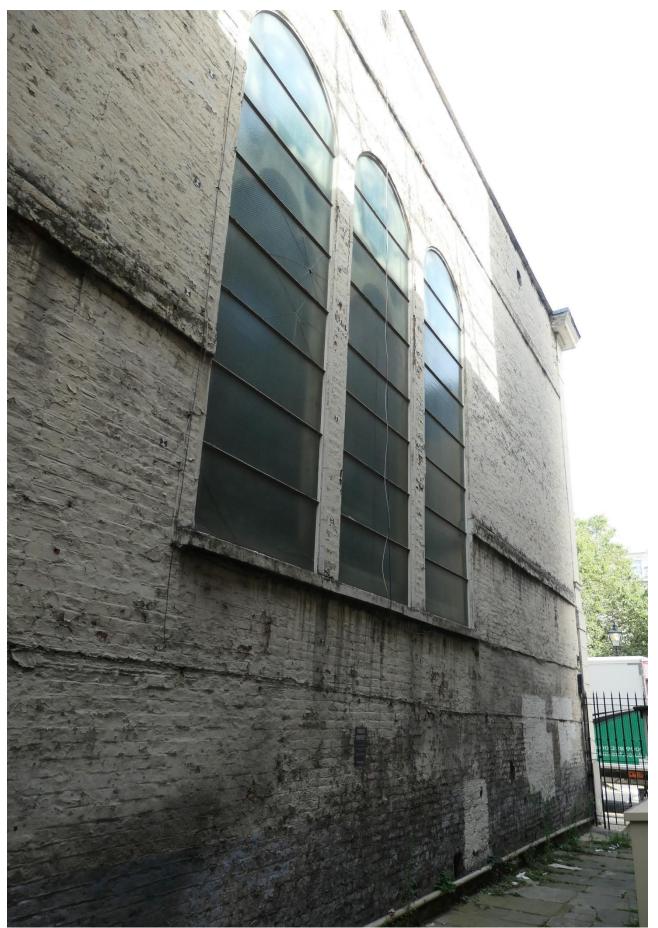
The facing elevation of the church is separated from the subject building by a narrow, poor quality alleyway, and this south facing elevation of the church is largely absent of decorative features.
